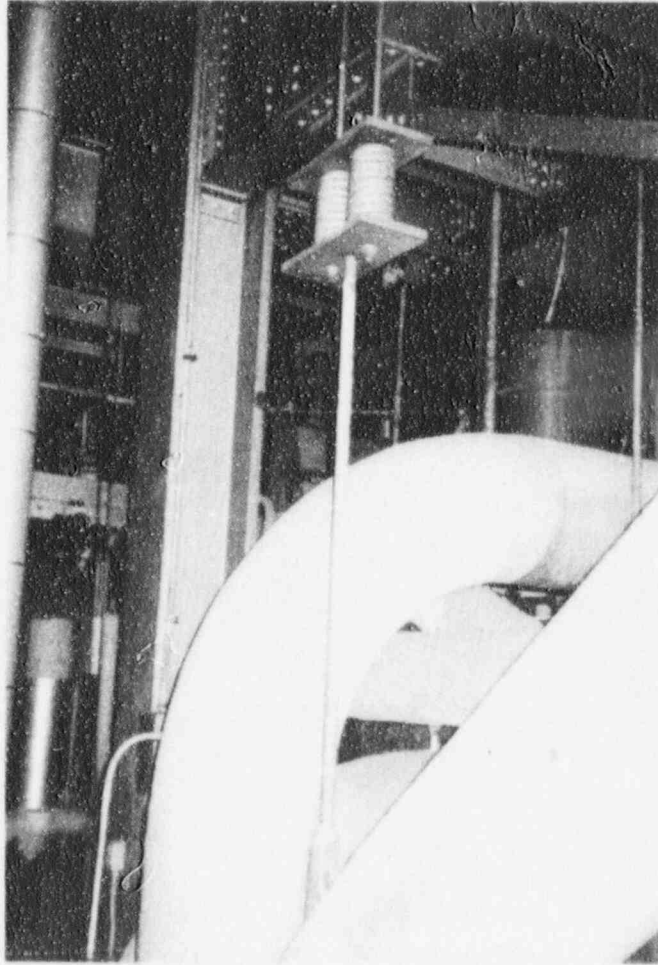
Field Fabricated Spring Hanger in Kern Unit 1
